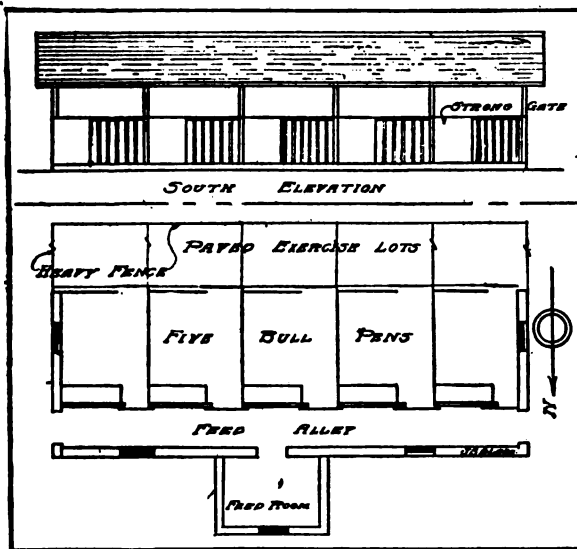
Elevation and plan of bull pens especially adapted to meet the needs of a pure bred breeding establishment.
